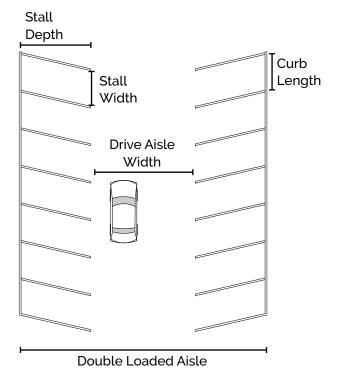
Parking Space and Drive Aisle Dimensions.
